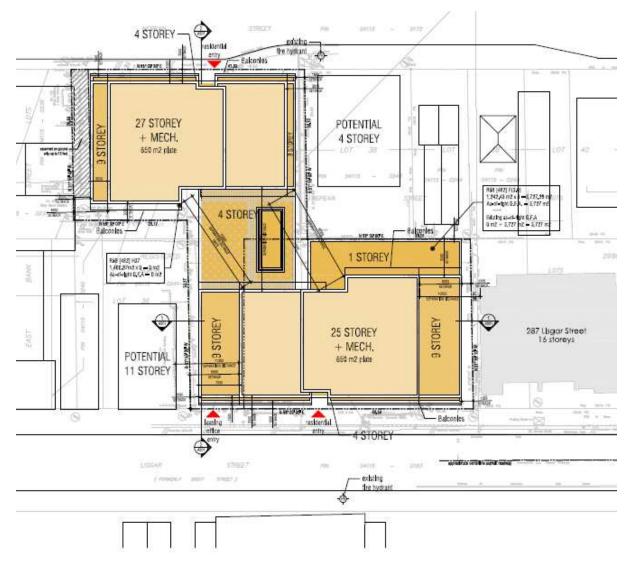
Plan view indicating the number of floors of the two towers, set back from the street and sideyards. Source: Graziani & Corazza Architects 2020
